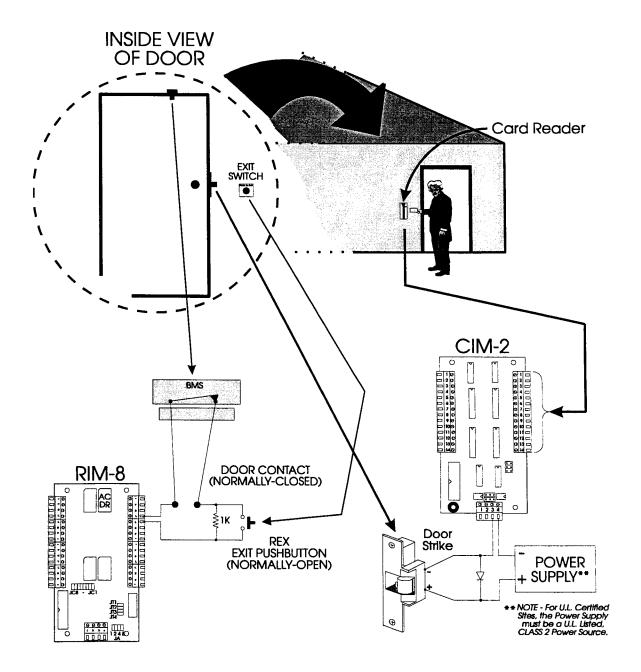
CIM-TYPE ACCESS CONTROL CONNECTION OVERVIEW
